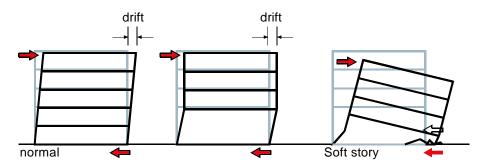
(a) Soft Storey due to Excessive Floor Height in Ground Storey
